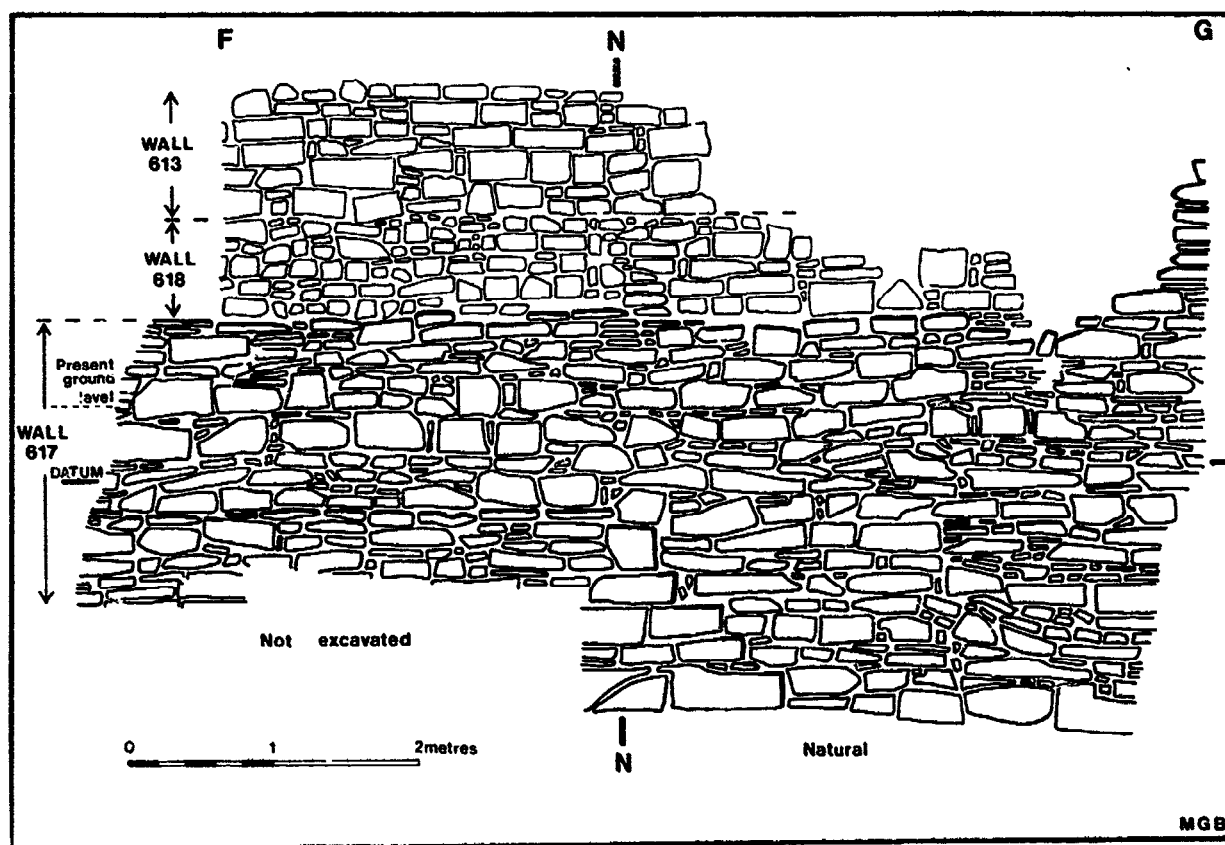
Cantilupe Street. Period 4: rear elevation of the medieval wall. Period 5: rebuilds 613 and 618. Section N is shown on fig 53:M1.G9
